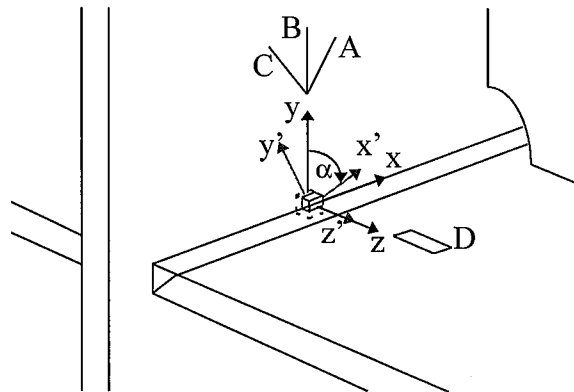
Element A (Specimen 3/ SE Girder-to-Column Weld Region)
